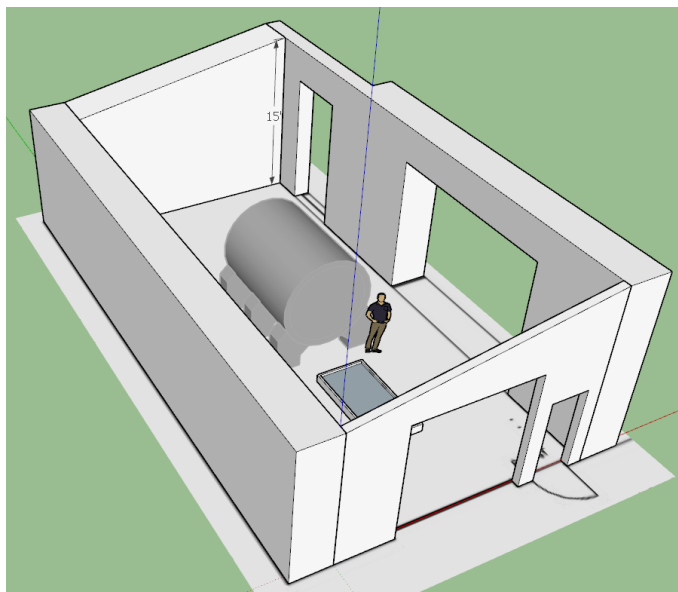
Basic mockup of PLANET chamber placement in existing laboratory space; view from the southwest.
